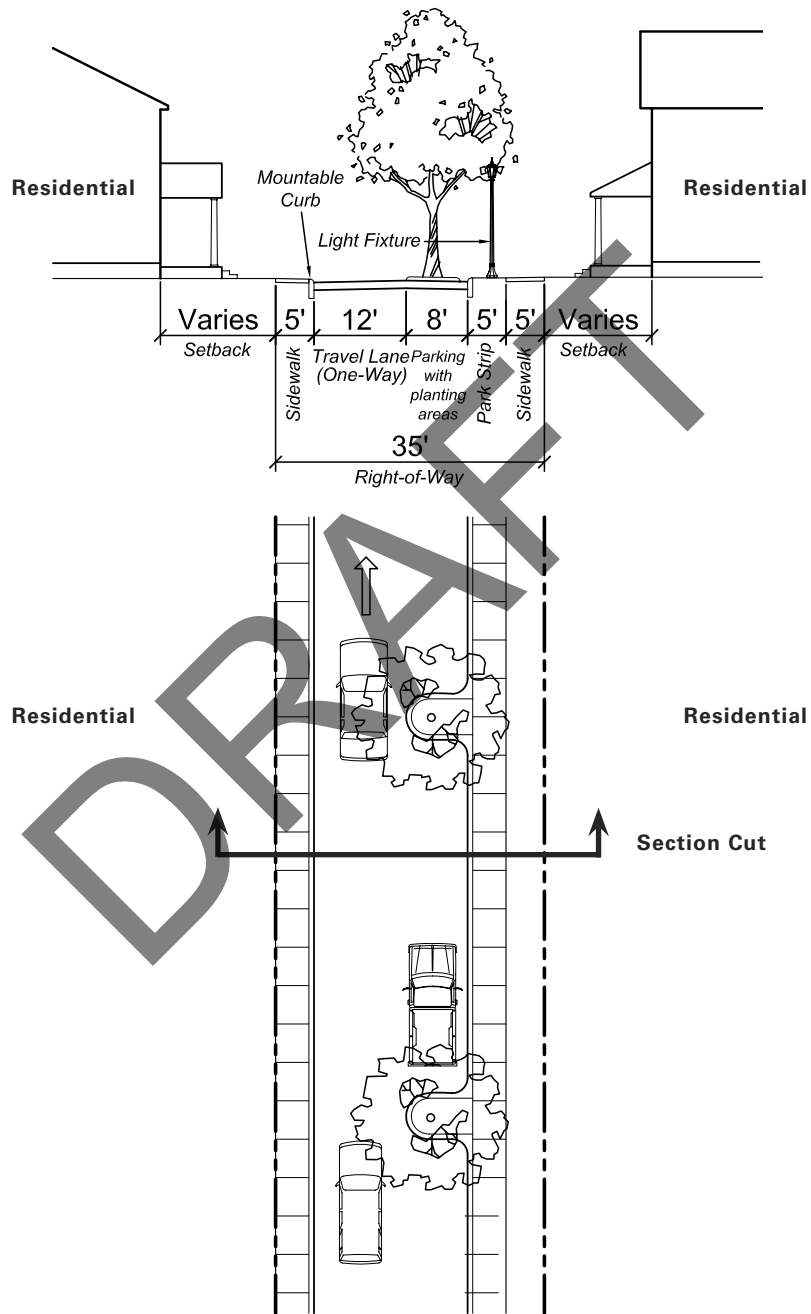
Proposed Section and Plan: Neighborhood Street C
